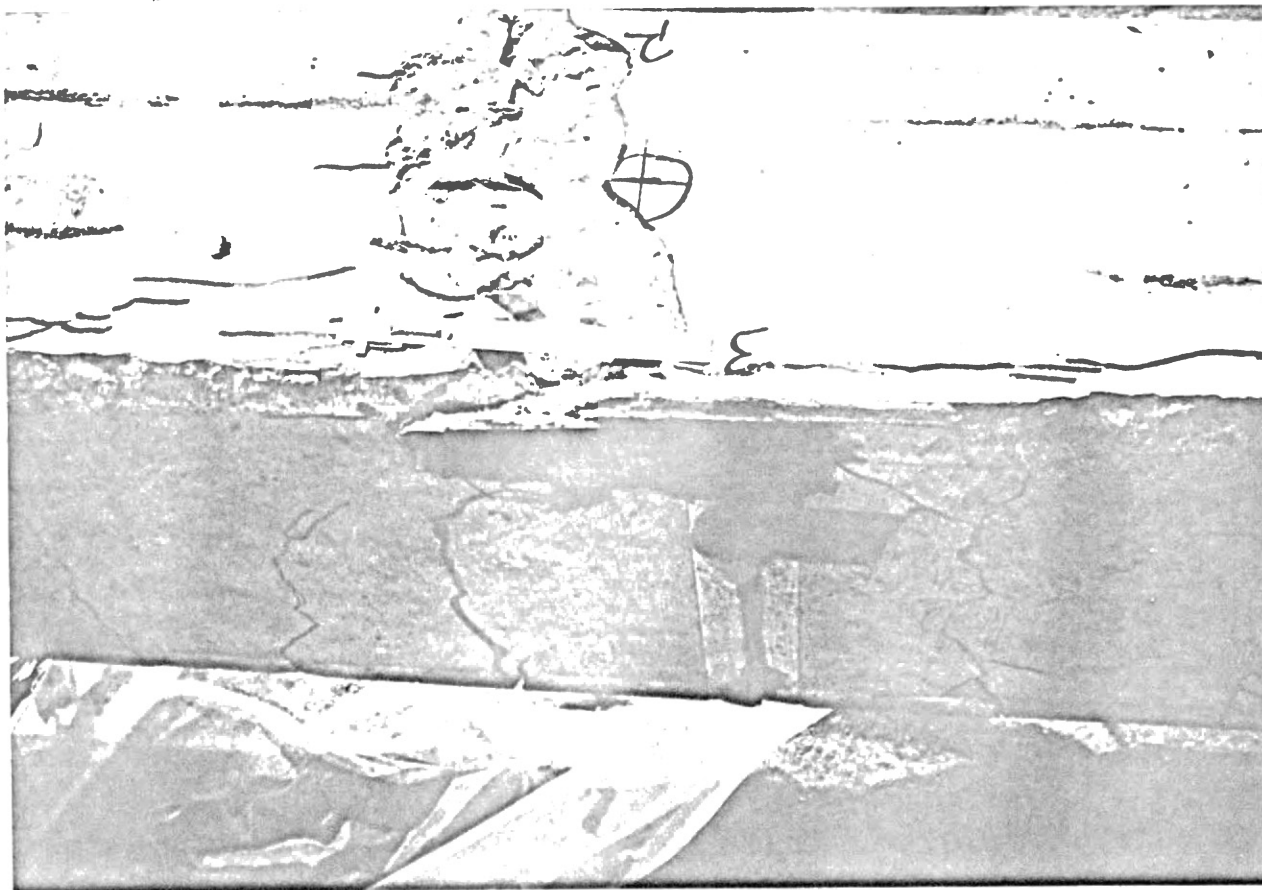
Beam 9 Center Section After Test 10 With Shallow Wedge-Shaped Crushing Zone
